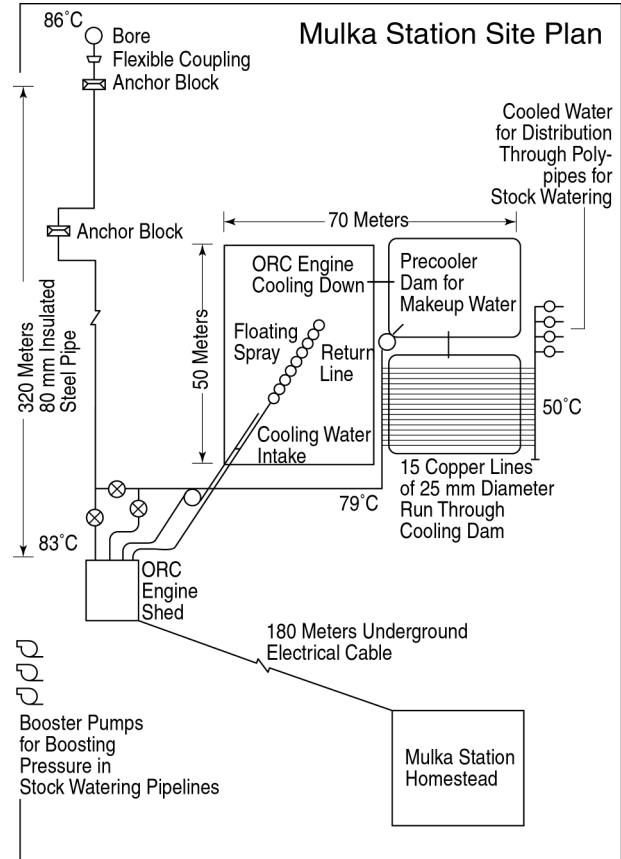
Mulka Station Site Plan. Adapted from Sawyer, 1991, Fig.3.
